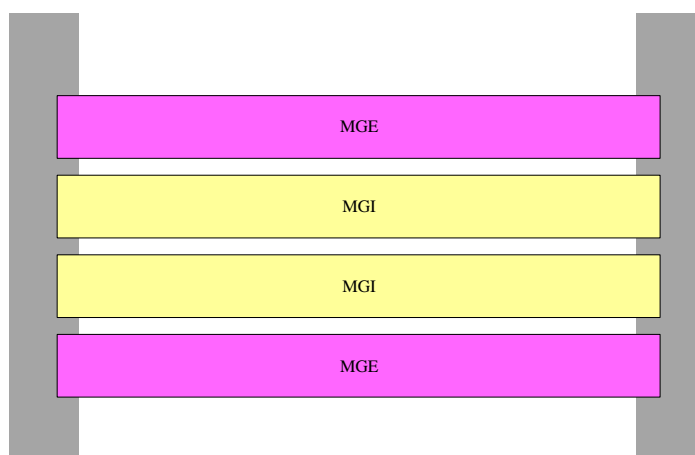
Bridge girder schematic of MGI and MGE elements.
